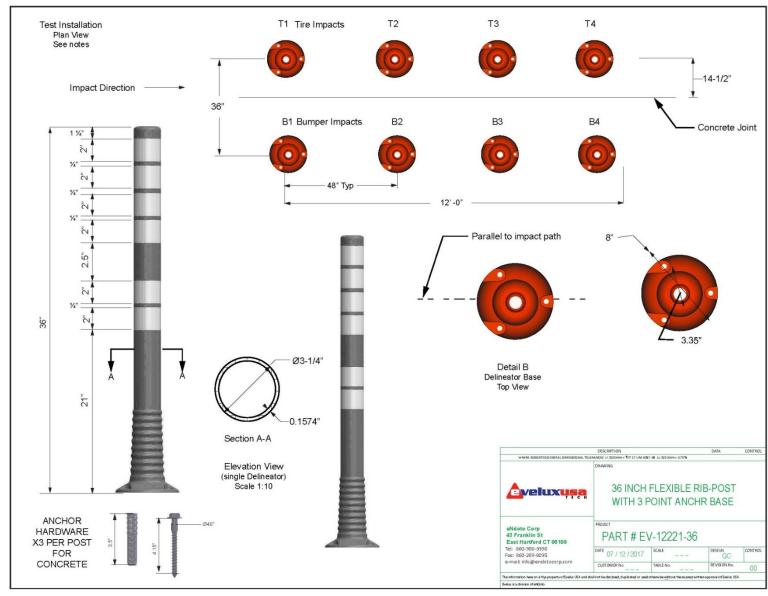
607531-02-11 Test Sample Details on Concrete Surface (Mechanical Anchors).
